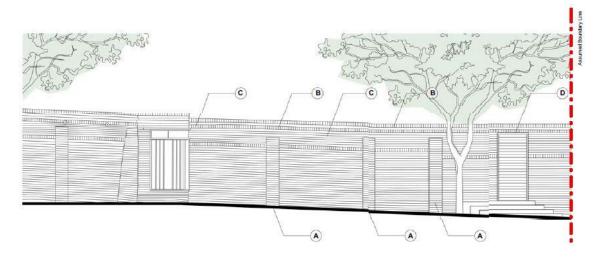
Proposed front elevation as viewed from No. 22 Frognal Way
